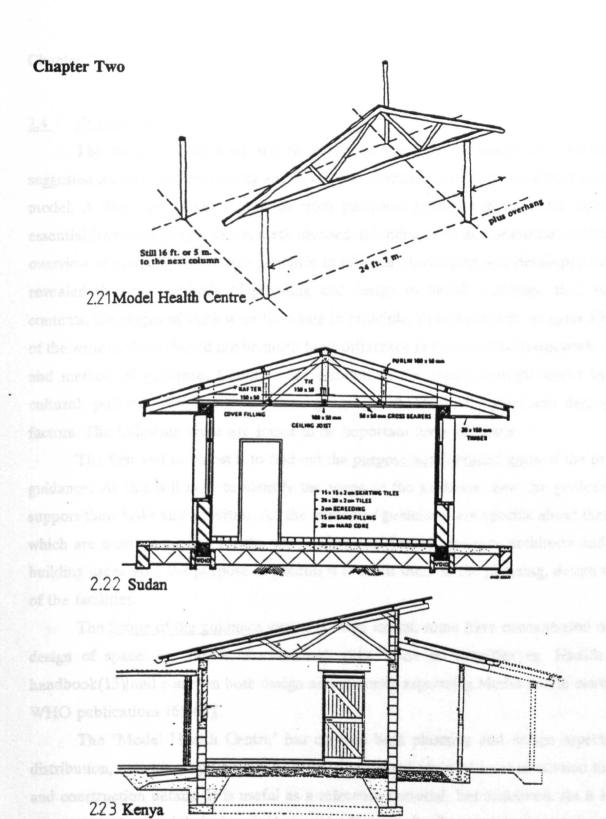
Typical section of type plans, Model health centre, Sudan, Kenya Source: (6, 22, 93).
